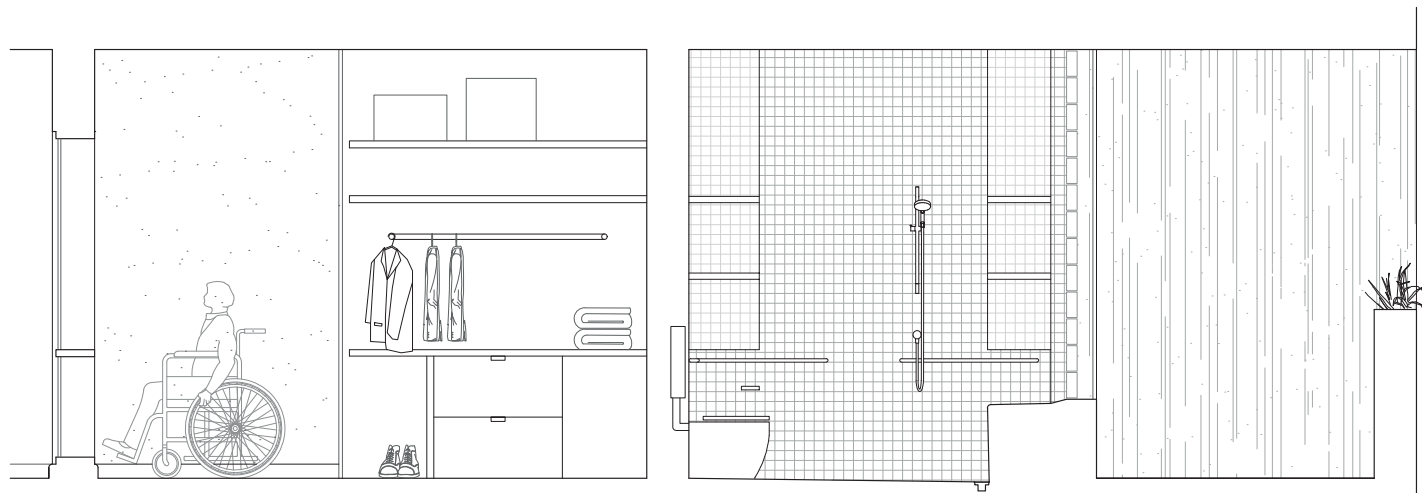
Interior elevation C of the typical cocoon. The design of the bathroom with a sitting area and hand held shower is inspired by Japanese bathrooms and also satisfies universal design requirements. This is a good example of multicultural/universal design.
